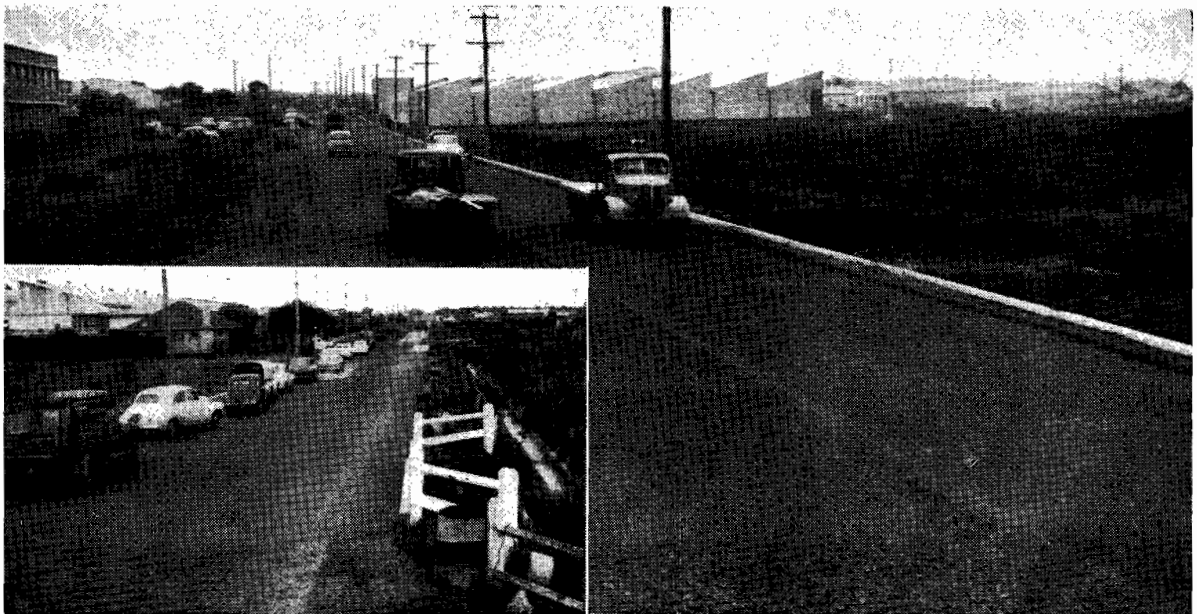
Bell Street, Preston, after widening and reconstruction near Albert Street.
